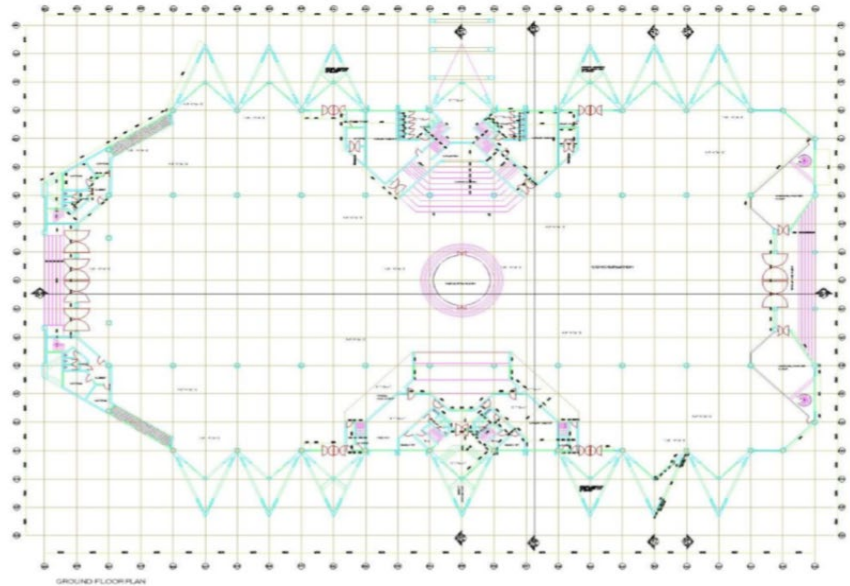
Ground Floor Plan - National Ecumenical Center, Abuja
